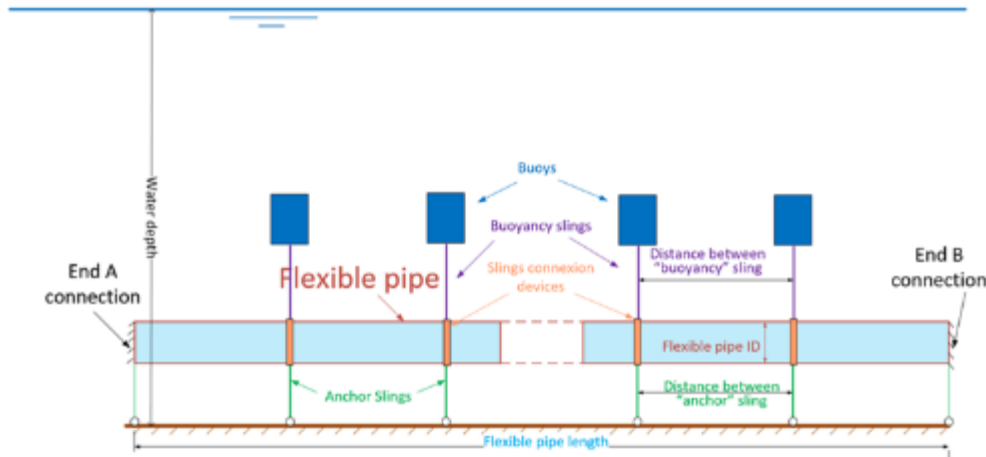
Longitudinal view of the 1st campaign flexible pipe system.
